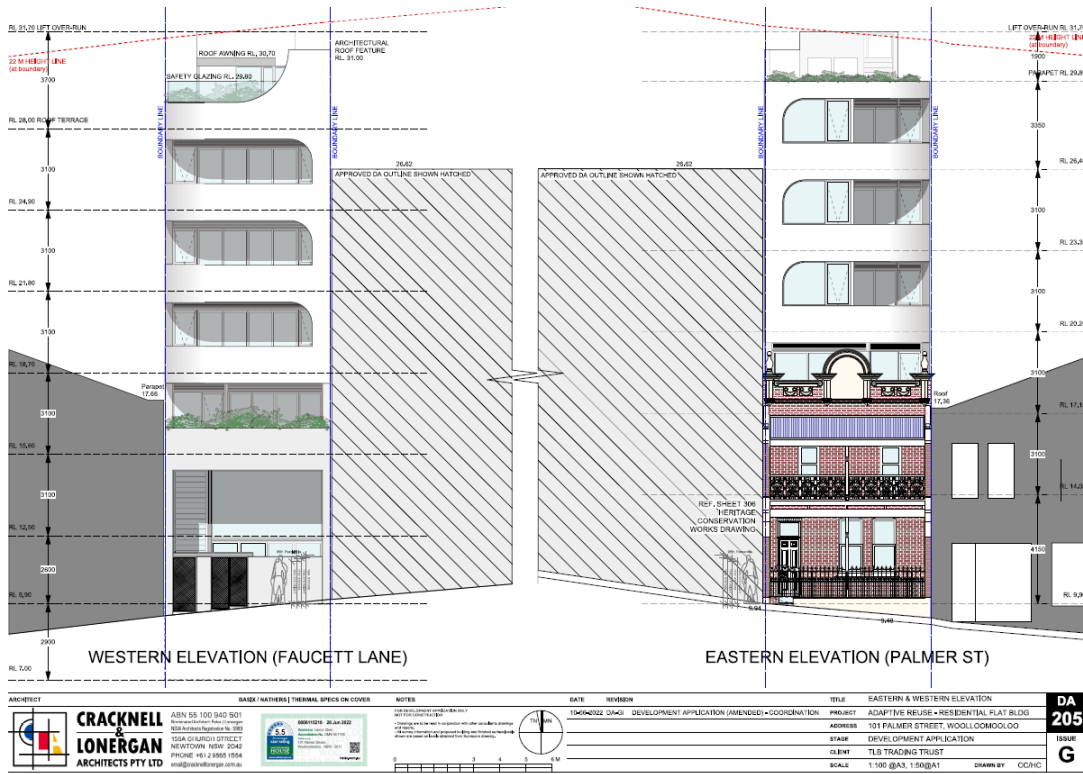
Proposed west Faucett Ln elevation (left) and east Palmer St elevation (right)
